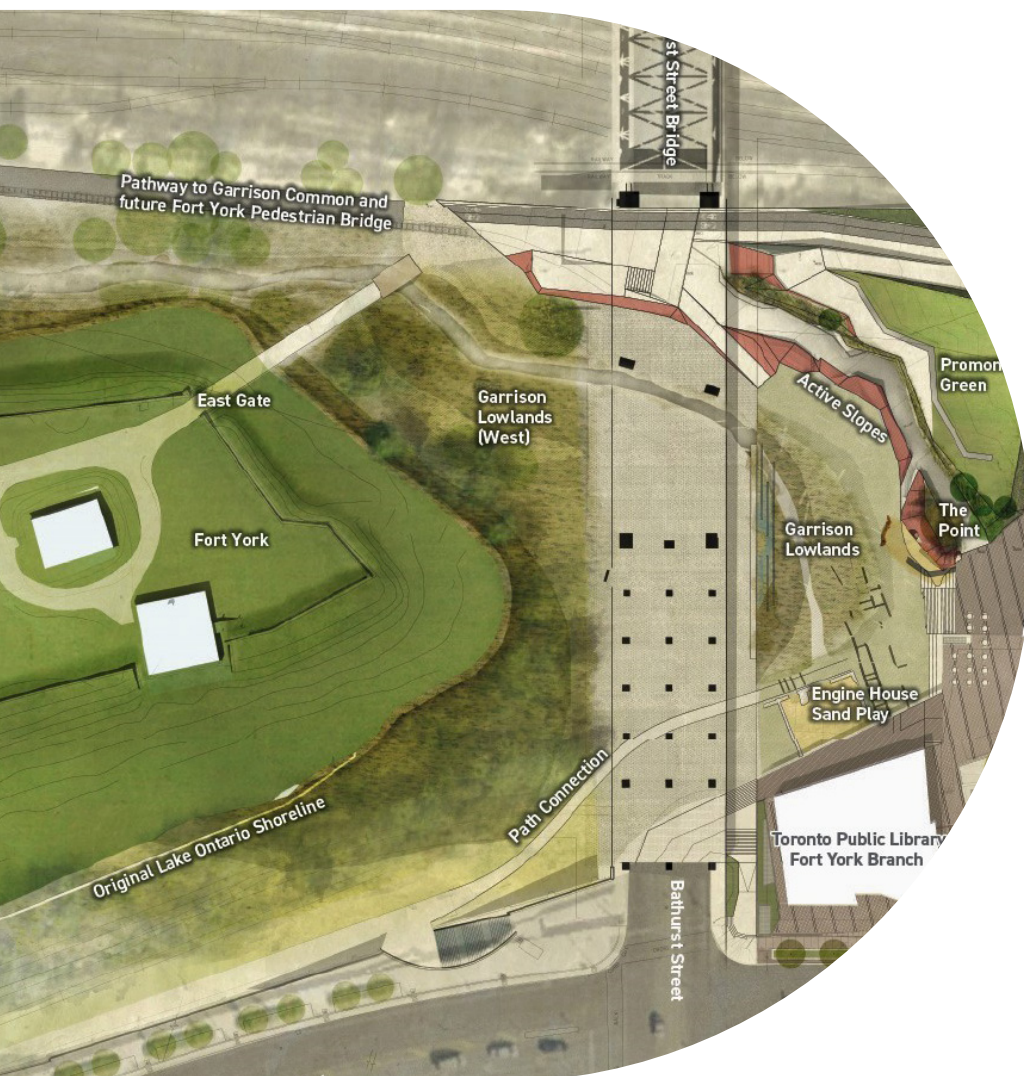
Plan rendering of the future Lower Garrison Creek Park.
